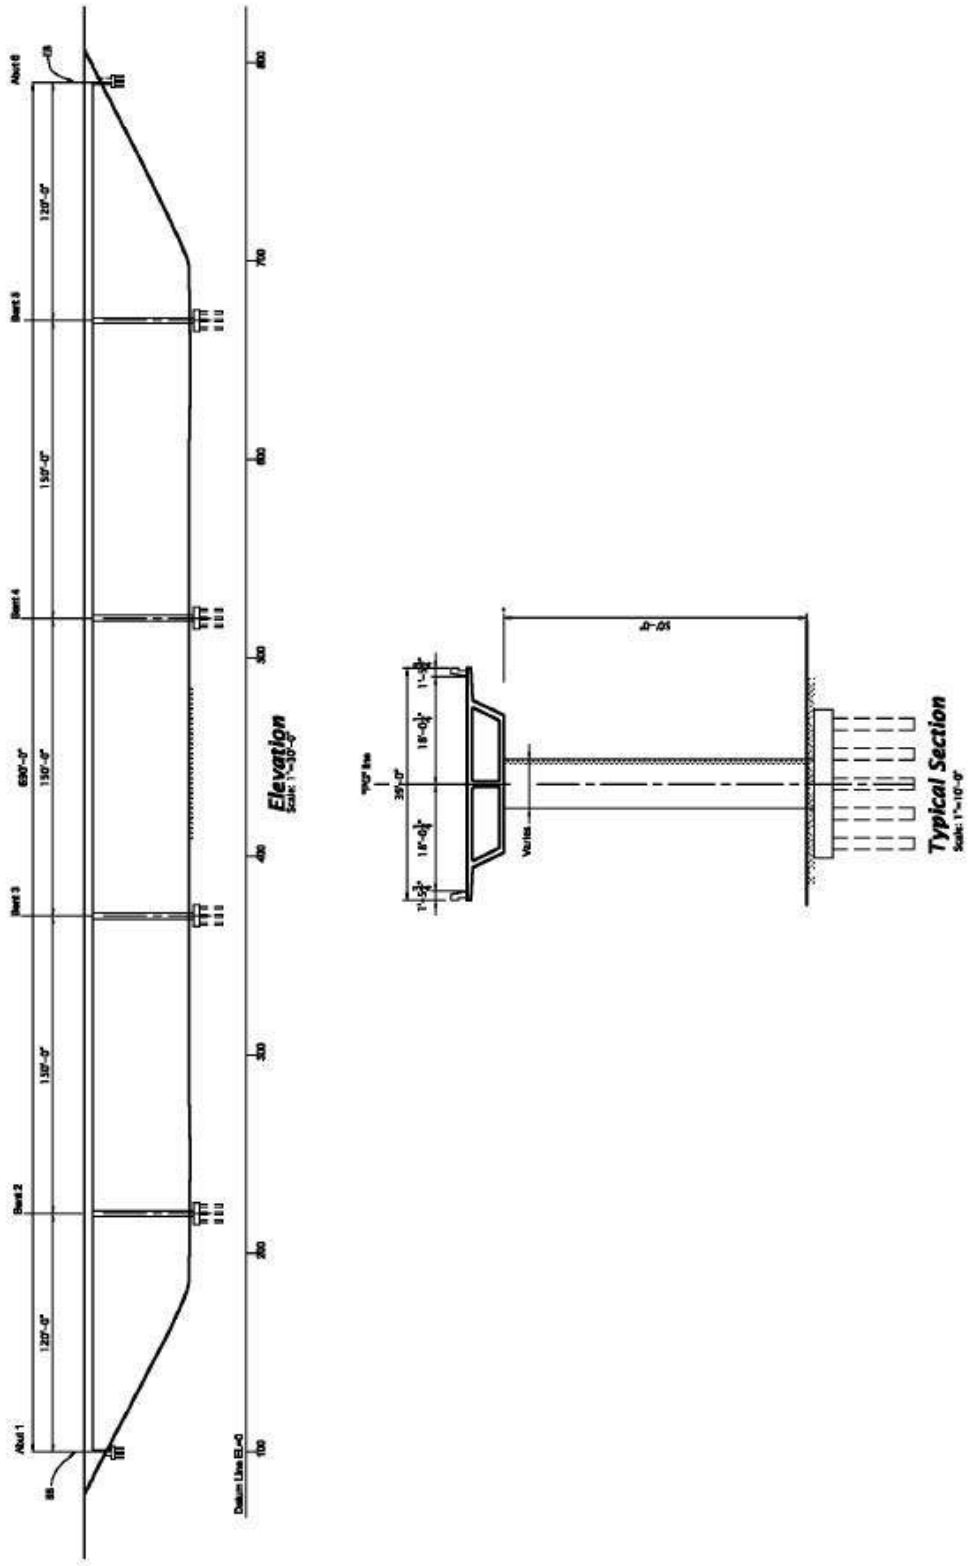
Bridge Type 11 (Ketchum et al., 2004)
